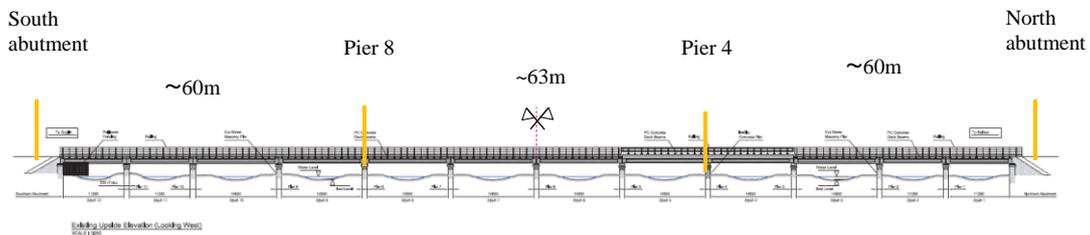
UBB 30 - Longitudinal frame arrangement 2
